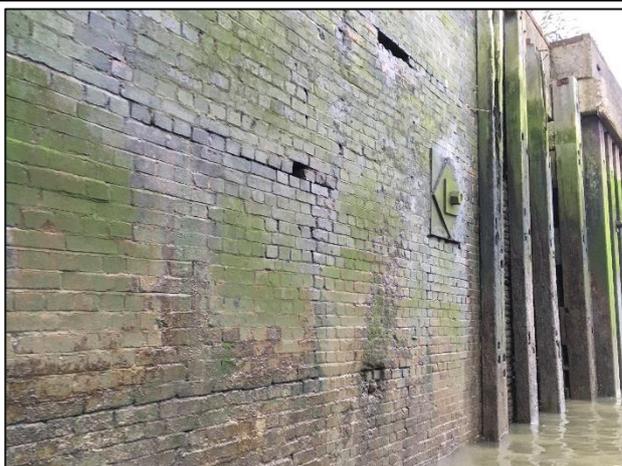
Horizontal crack, missing bricks and ground anchor
